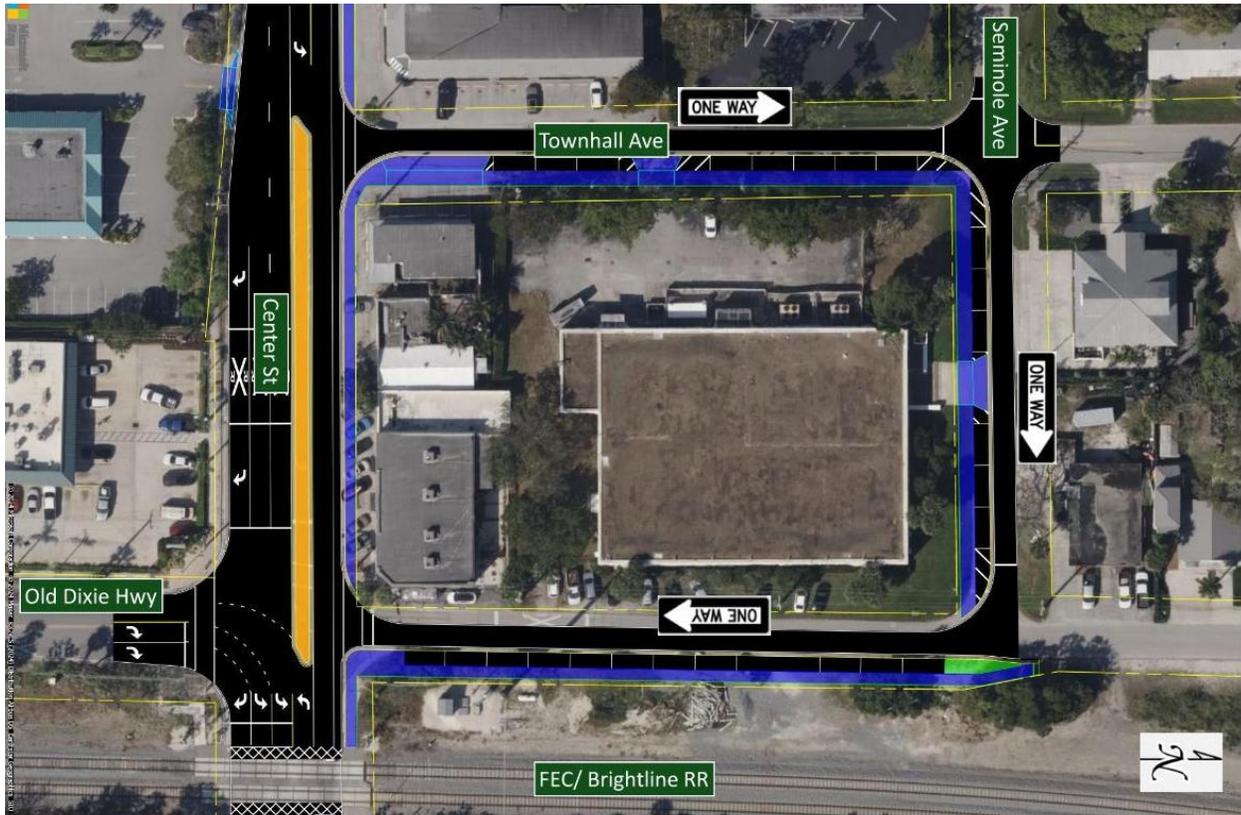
| Side Street One-Way Section With Parking Alt 2
